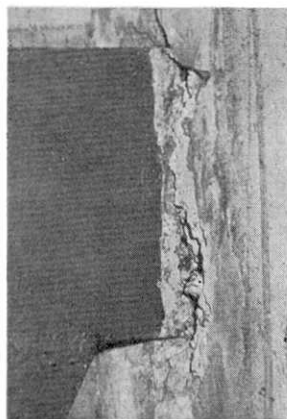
Damage to a protection device which prevents a girder falling.
